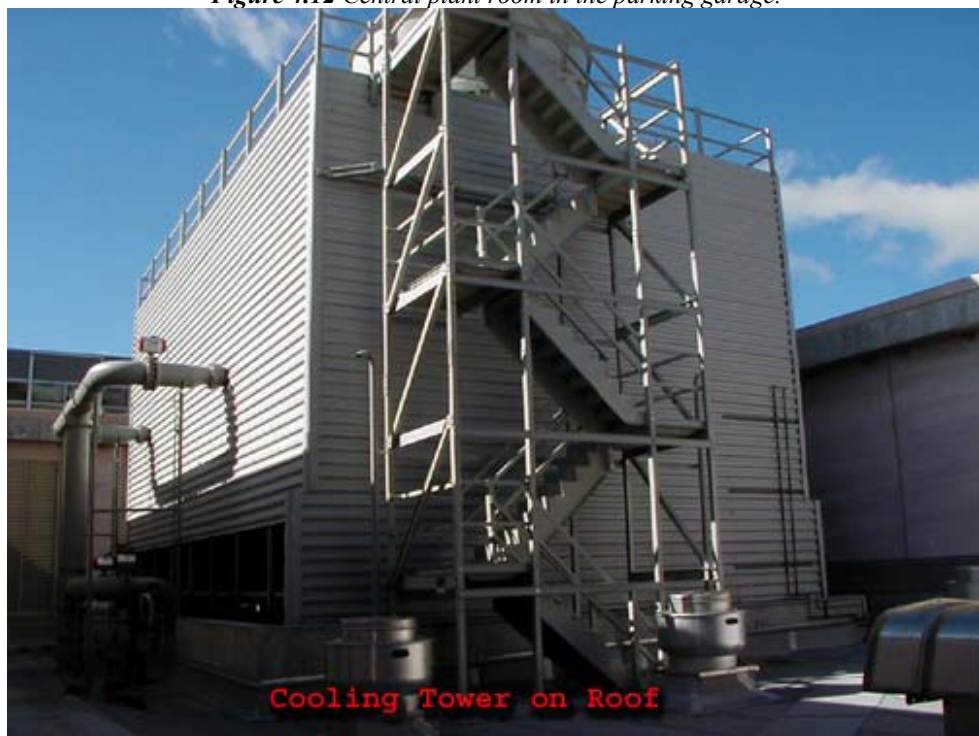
Detailed view of cooling tower on the roof of the parking garage.
